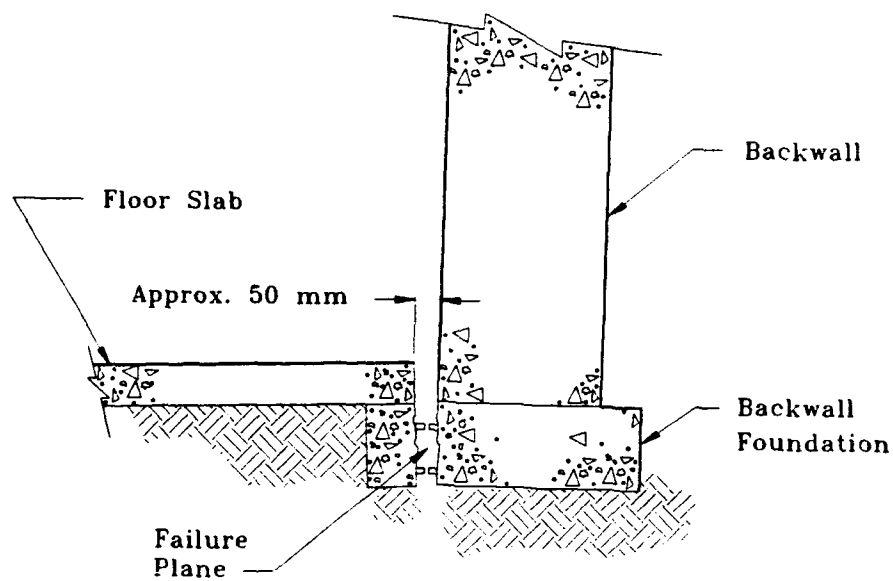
Section: Failure plane in backwall foundation, PAS-3.
